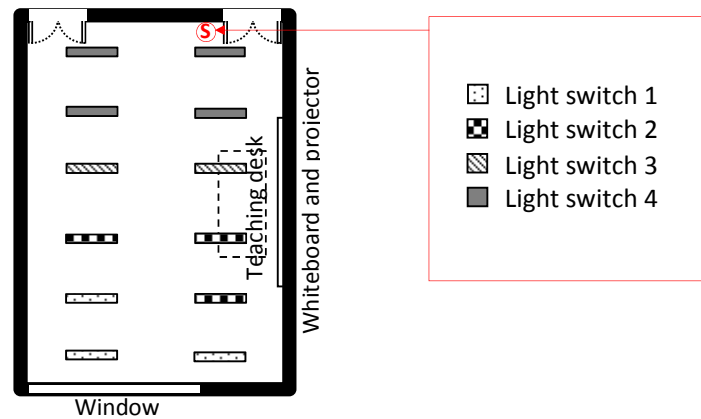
12 Lighting lay out and groups of control switches of the room AR206.
